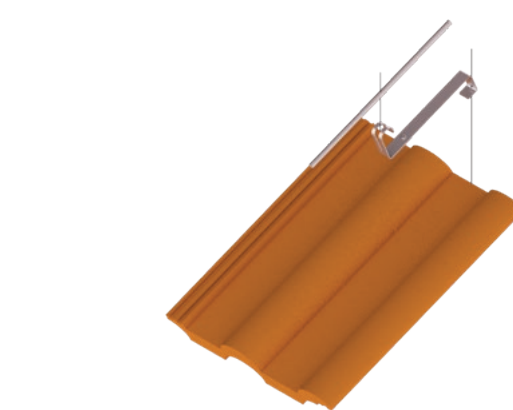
Installation of suitable roof load-bearing elements on concrete/brick roofing
